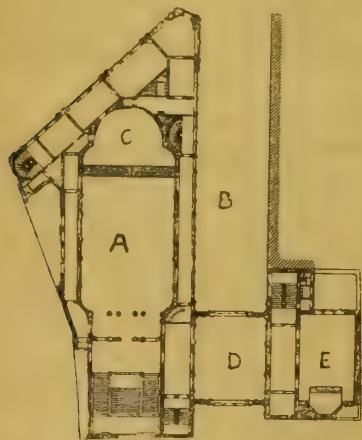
A, concert-hall; B, street; C, orchestra; D, foyer; E, minor hall.
